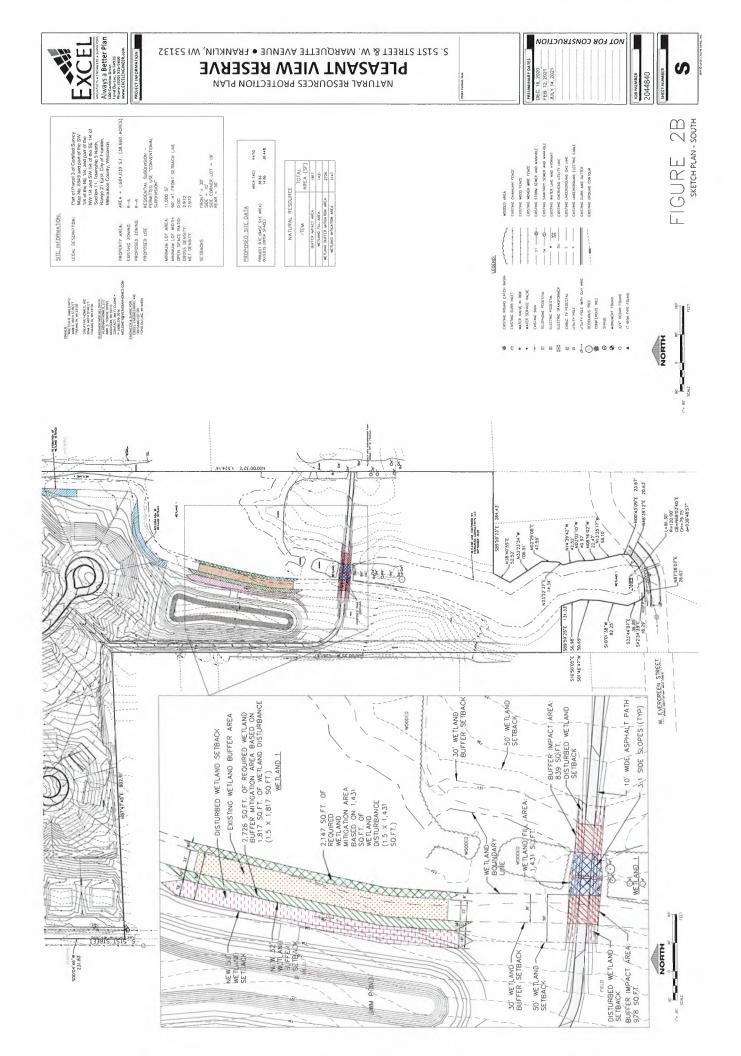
PROPOSED SITE DEVELOPMENT SKETCH PLAN
